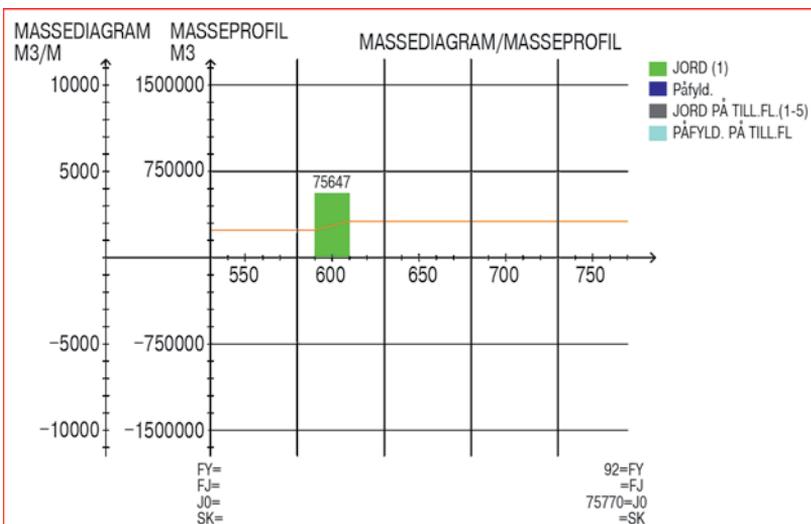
Volume of road embankments and excavations along the planned road layout.
